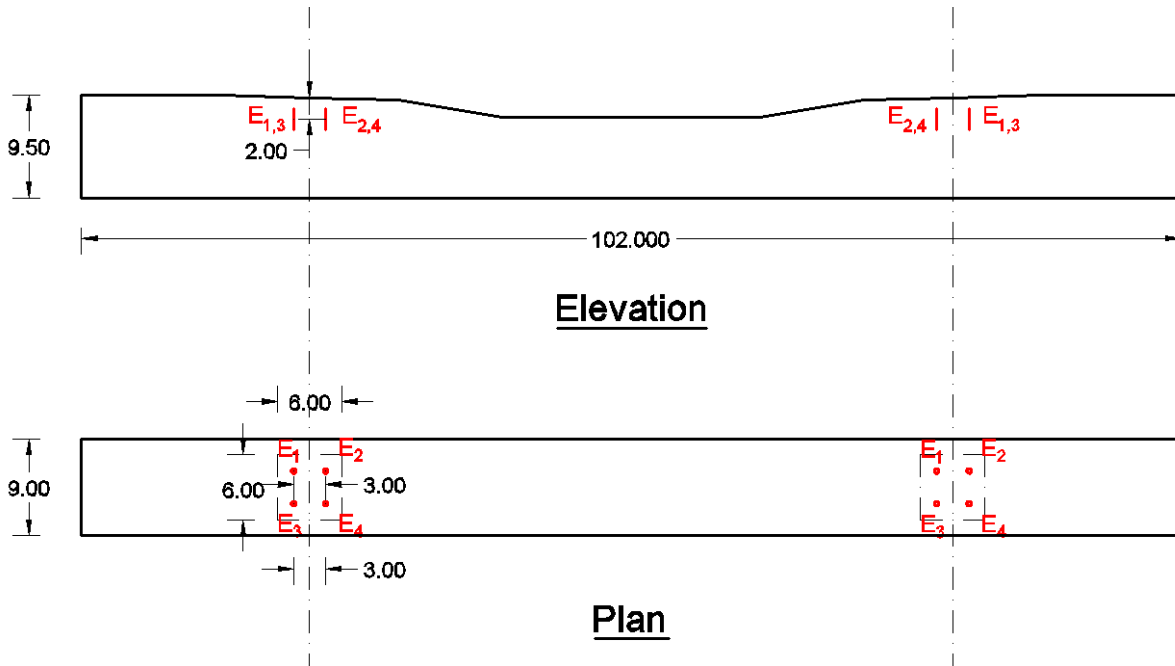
Elevation and Plan View of Concrete Crosstie Installed with Embedment Strain Gauges
